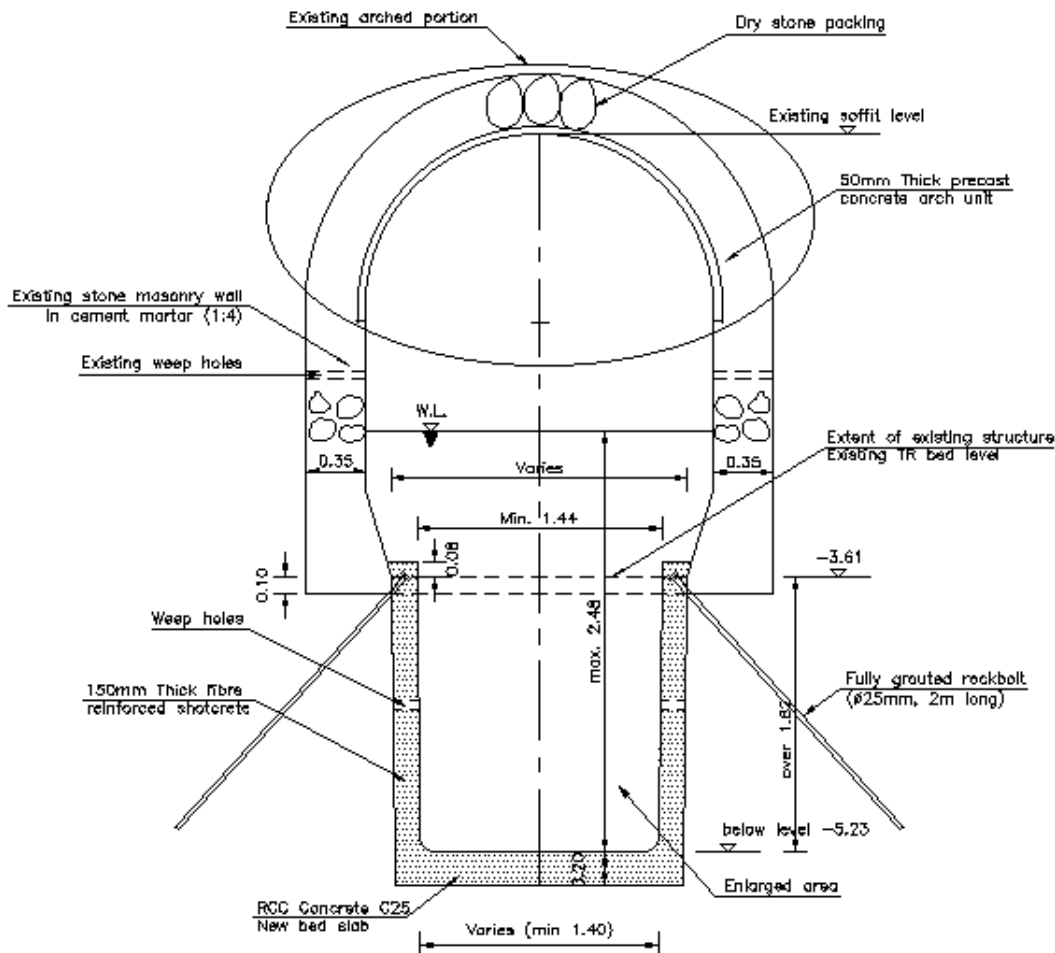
Typical tailrace tunnel support provision during tunnel enlargement
